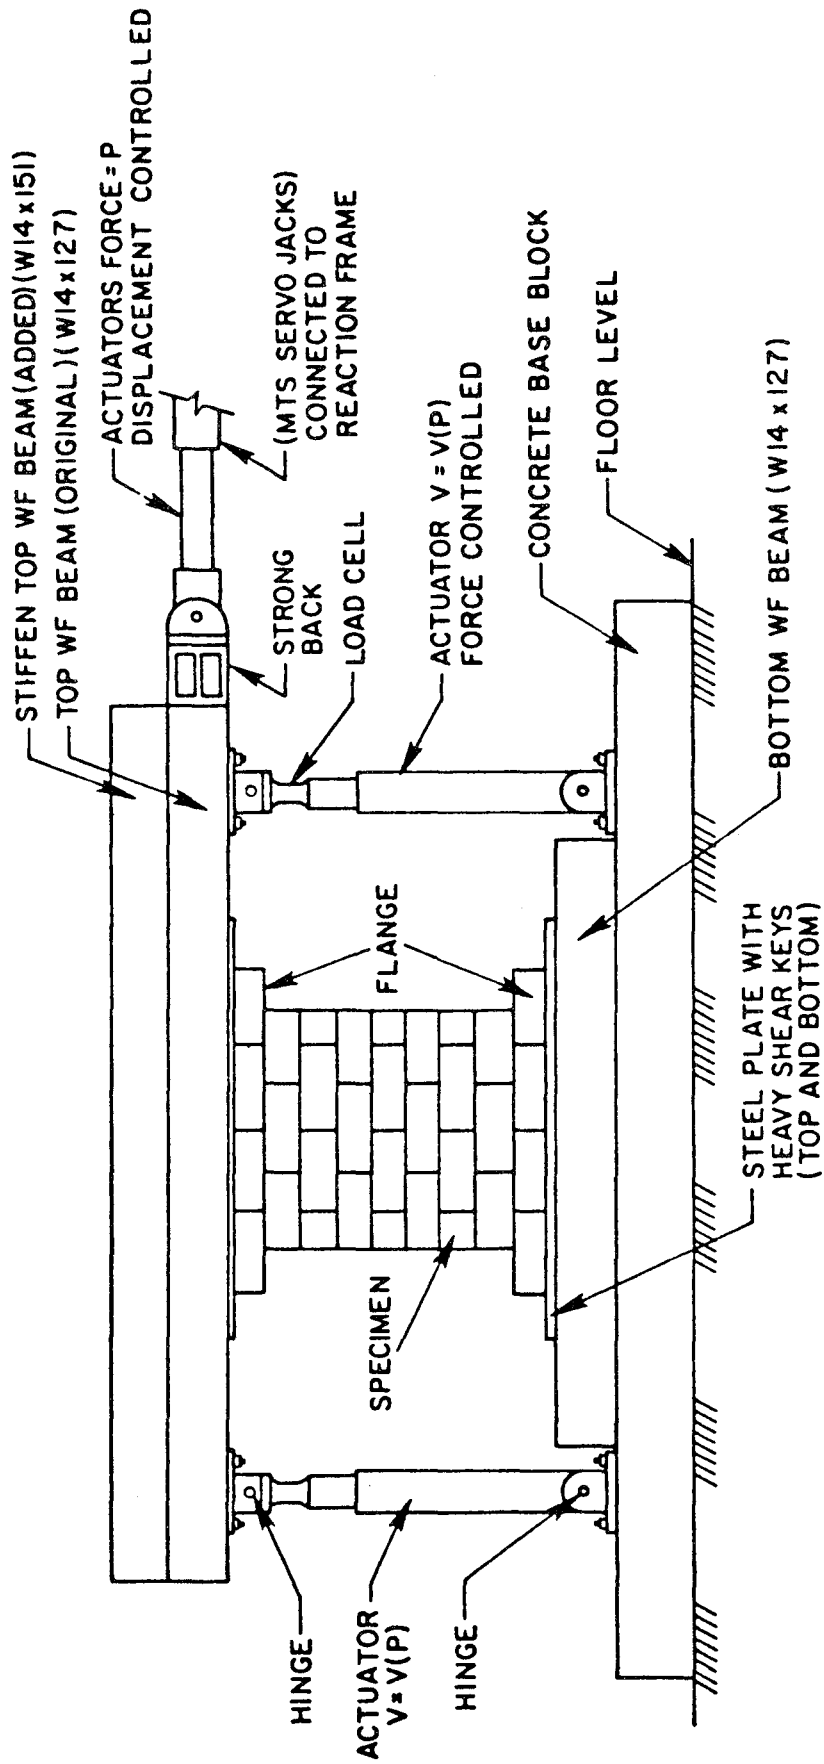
SCHEMATIC ILLUSTRATION OF MASONRY PIER TEST SETUP
